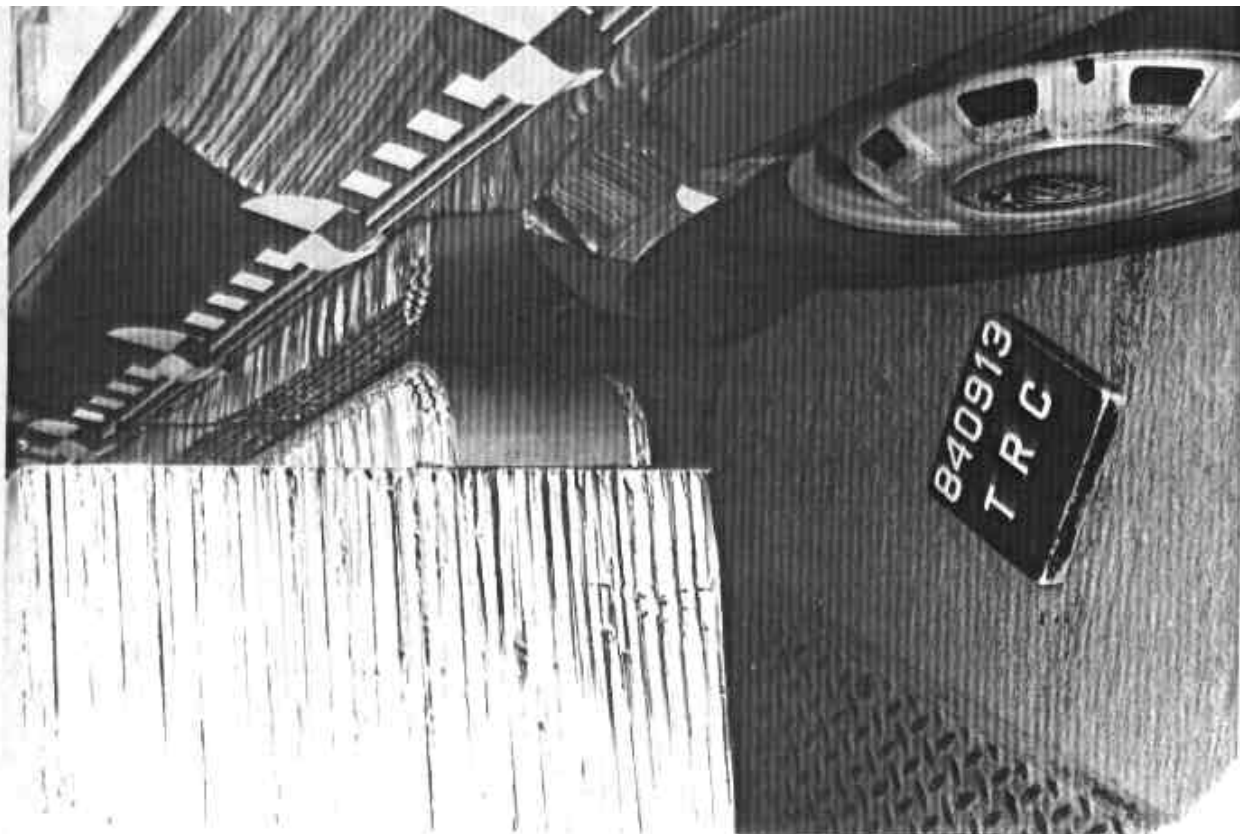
PRE-TEST CLOSEUP - VIEW 3
